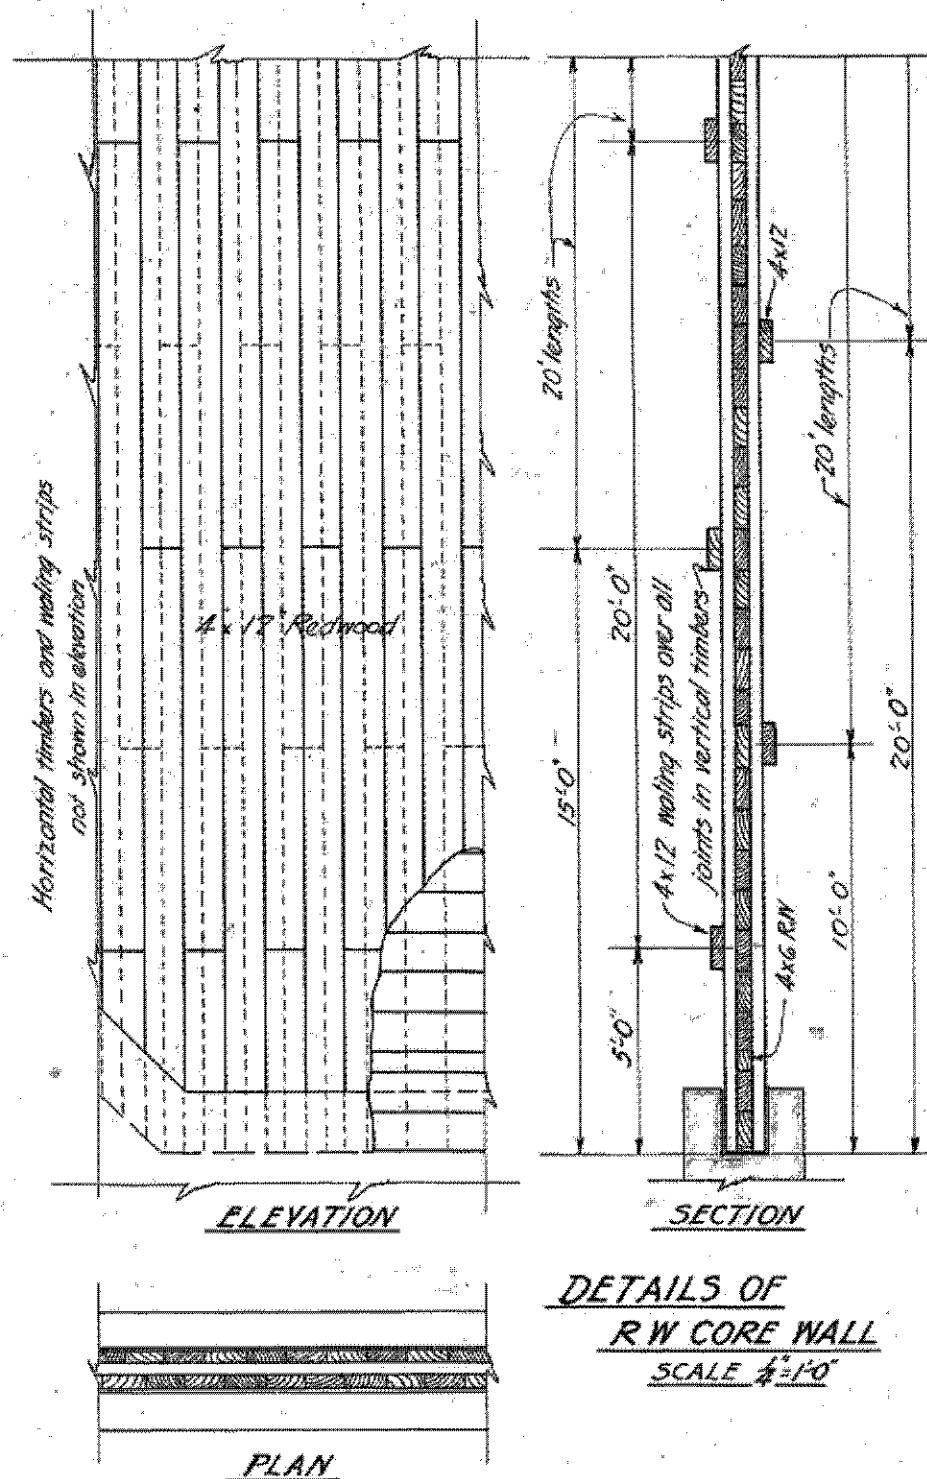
Ku Tree Dam, 1924. (Tropical Lightning Museum, Schofield Barracks, Hawaii, Historical photograph 87.76.01-29)
